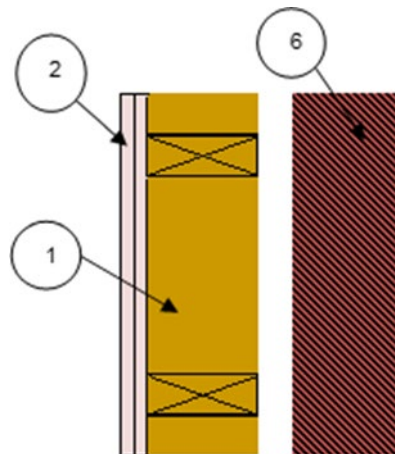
External brick wall (or equivalent) with timber framed wall – Section view
